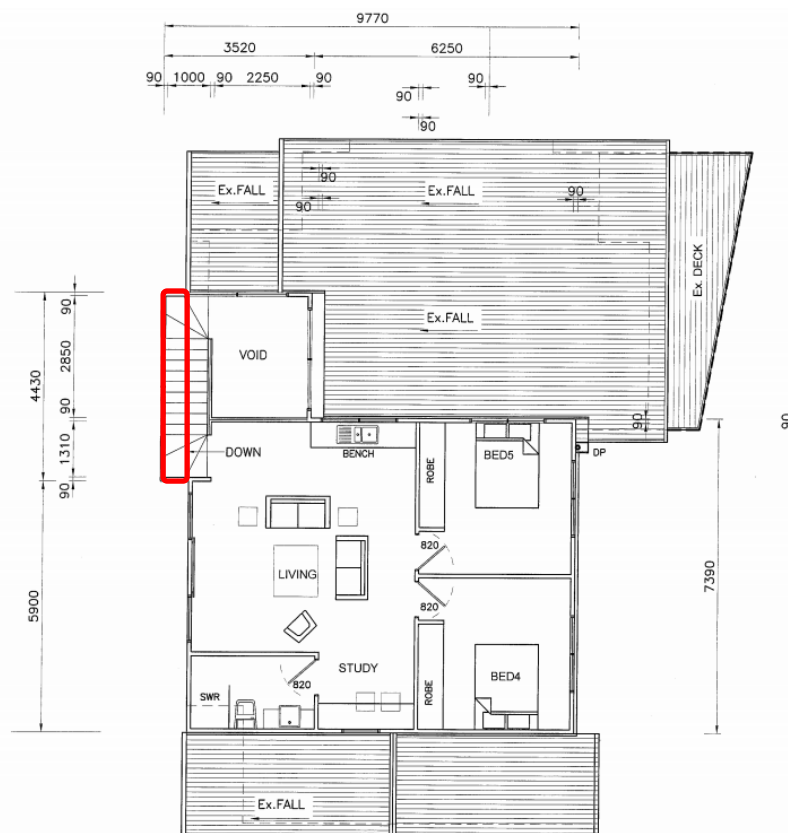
The proposed upper storey addition with part of the staircase (red highlight) being outside the existing building setback from the frontage.
